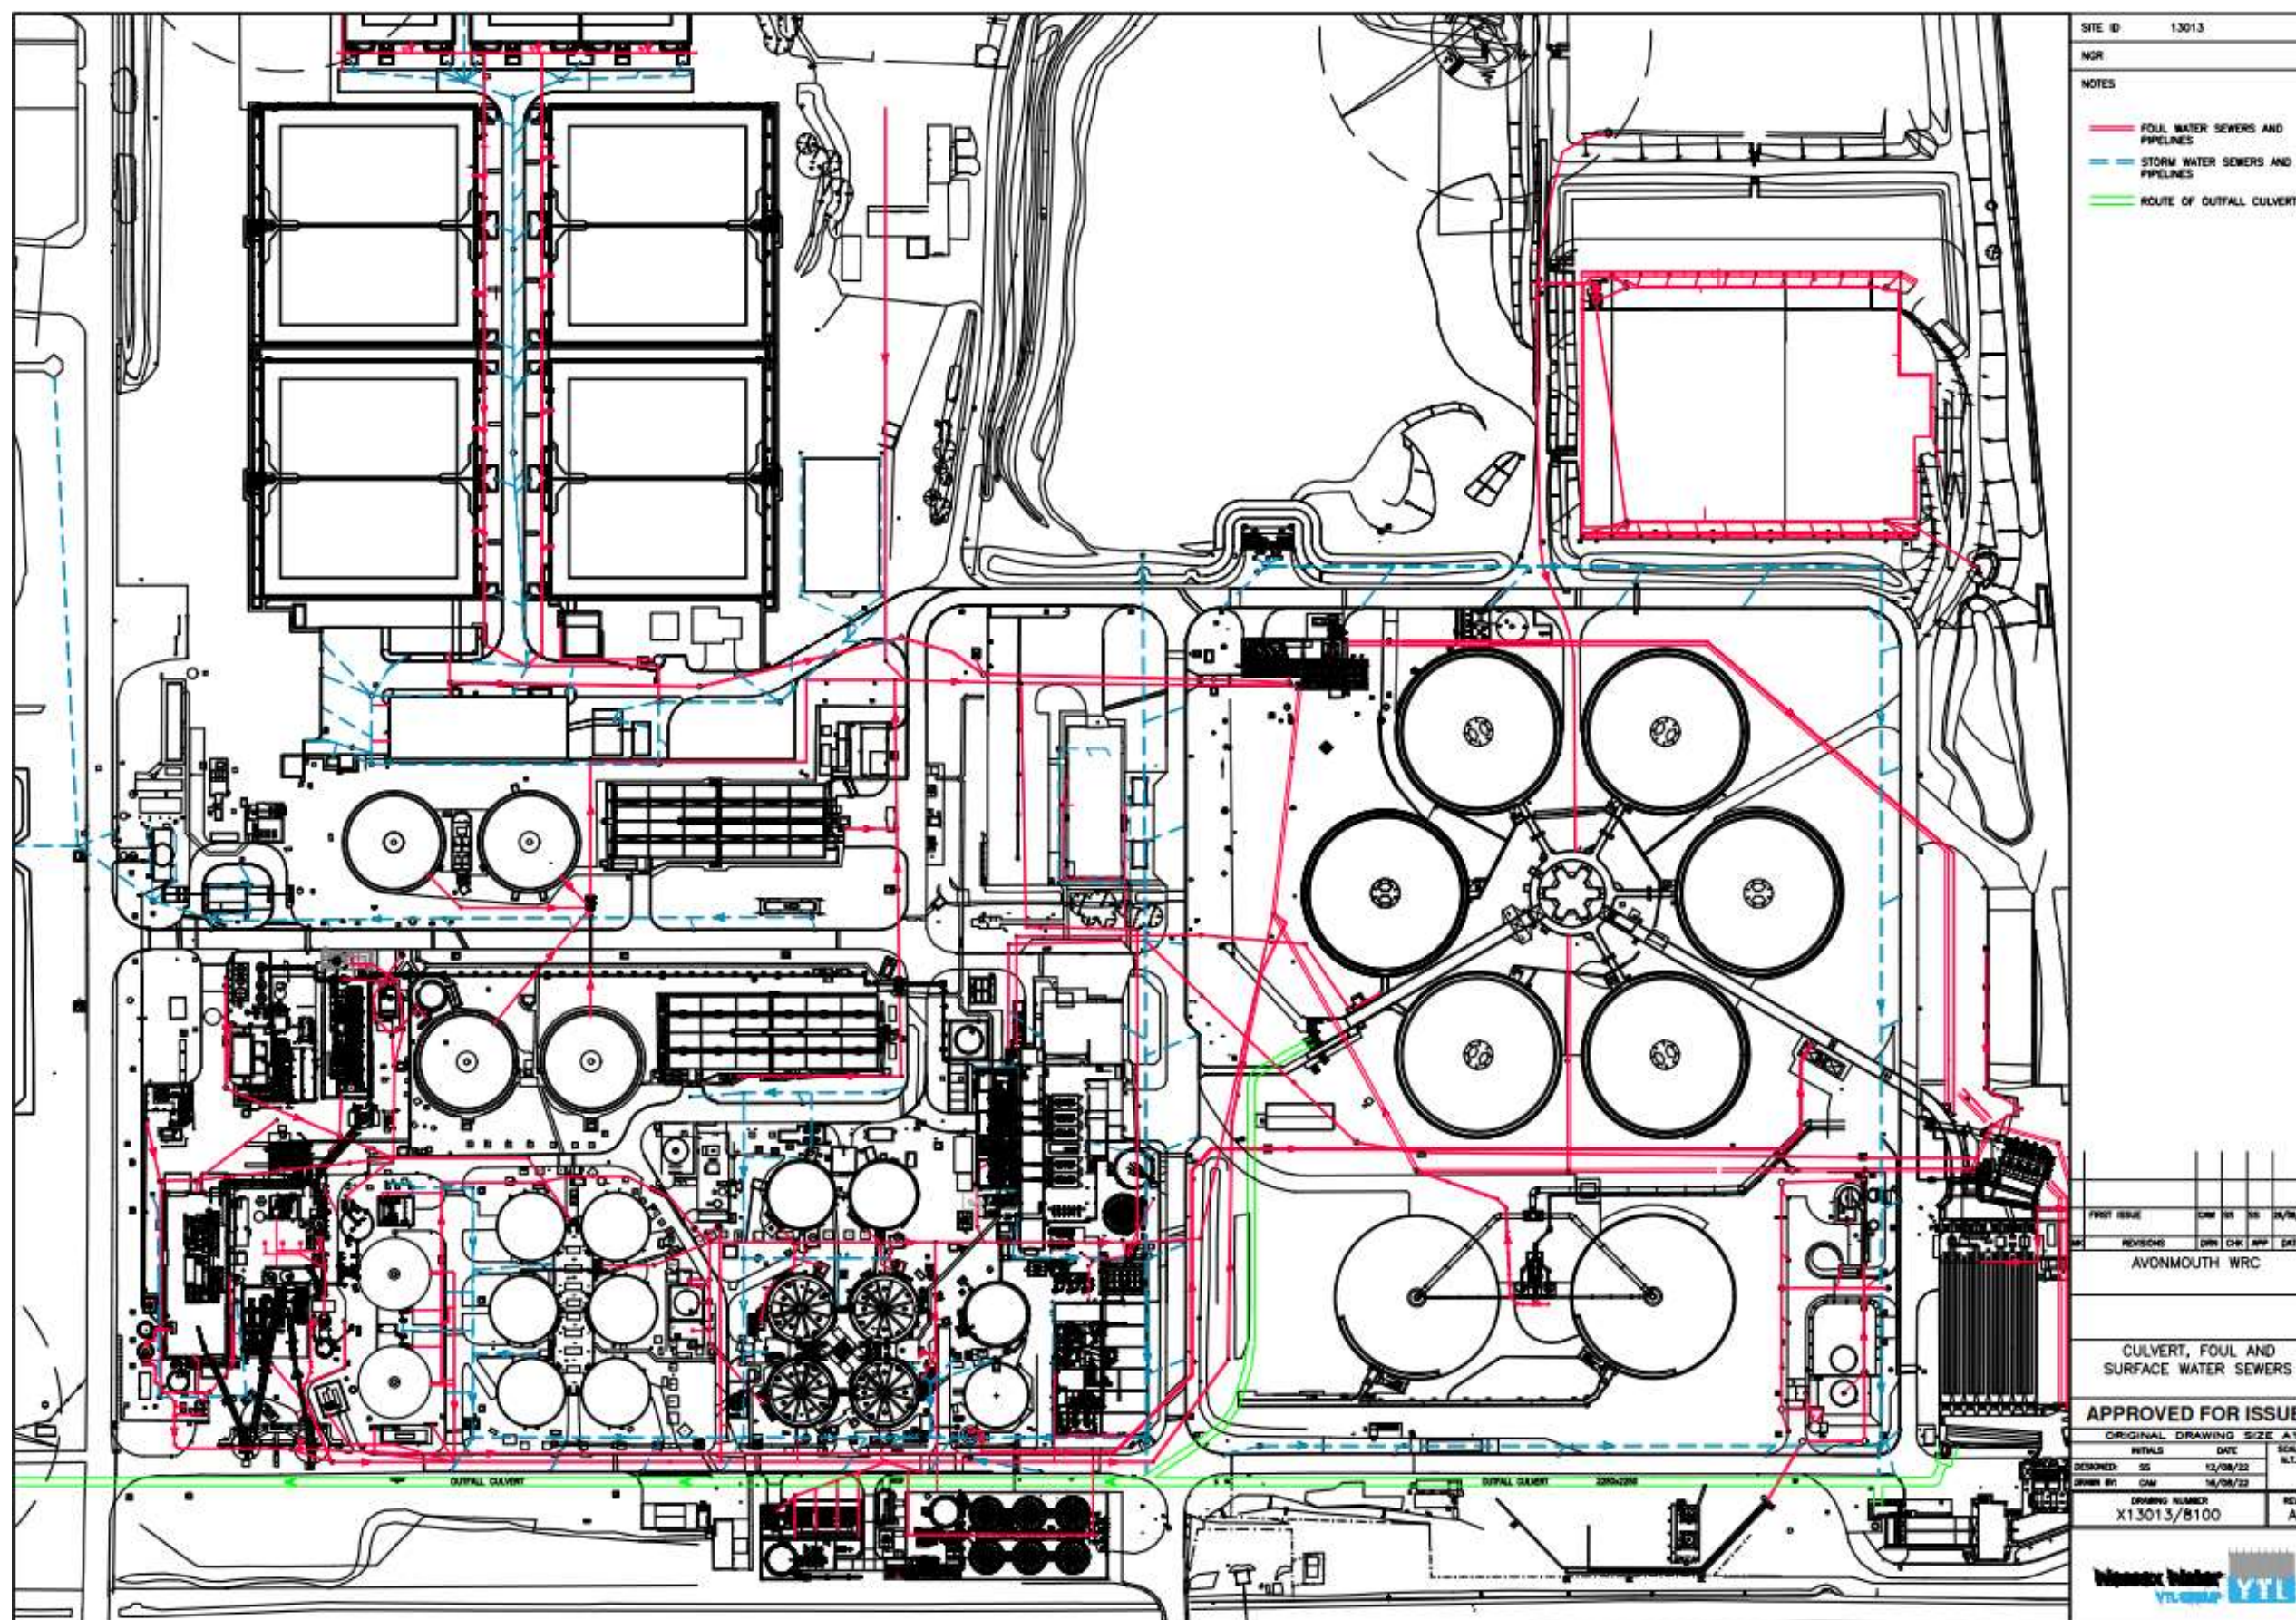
Below Ground Site Drainage Arrangements at the Avonmouth Site.
